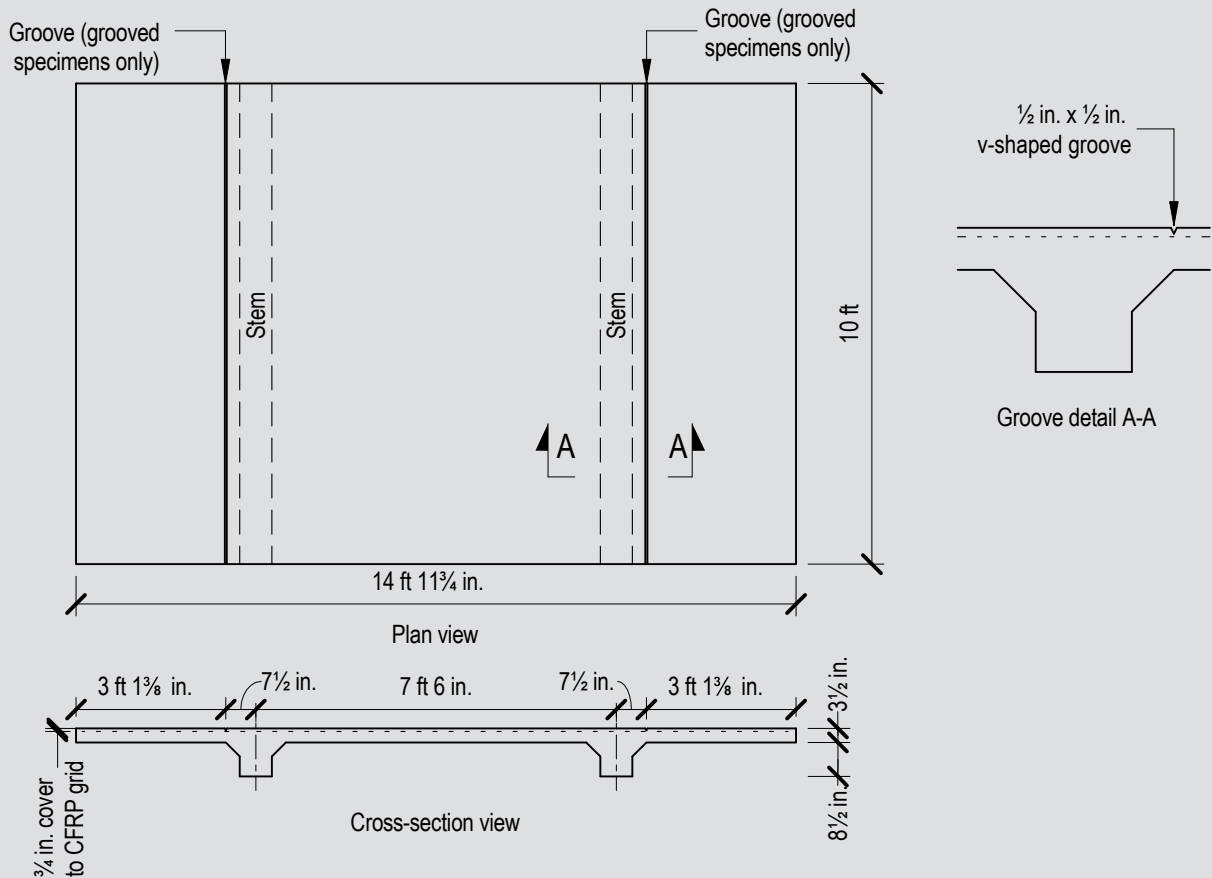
Test-specimen details (longitudinal reinforcement not shown). Note: 1 in = 25.4 mm; 1 ft = 0.305 m.
